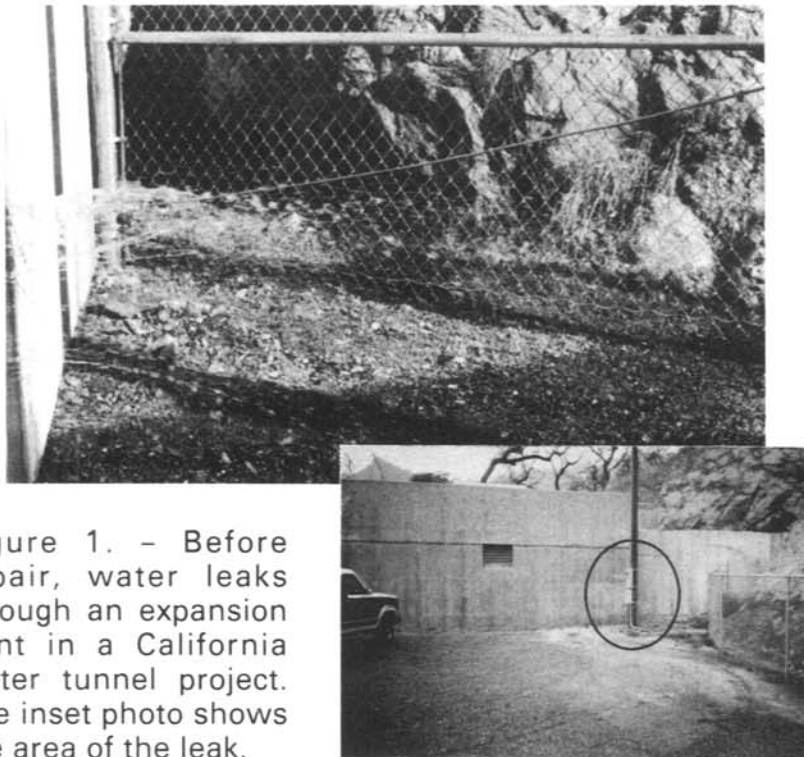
Before repair, water leaks through an expansion joint in a California water tunnel project. The inset photo shows the area of the leak.
